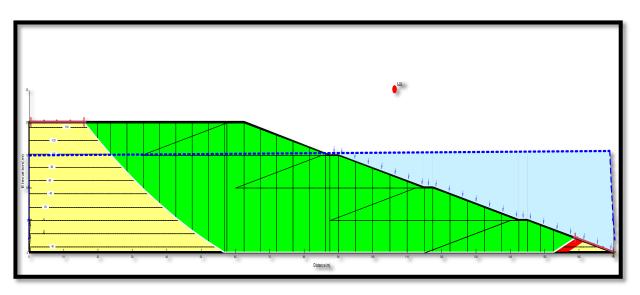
Embankment cross section for 1:5 slope at 15 m water level
